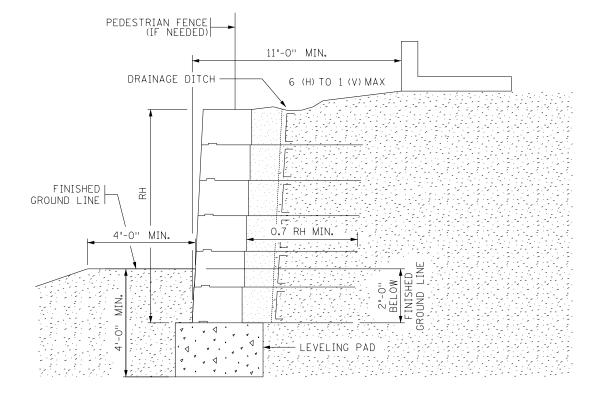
Minimum Traffic Distance for a PMBW with Soil Reinforcement
